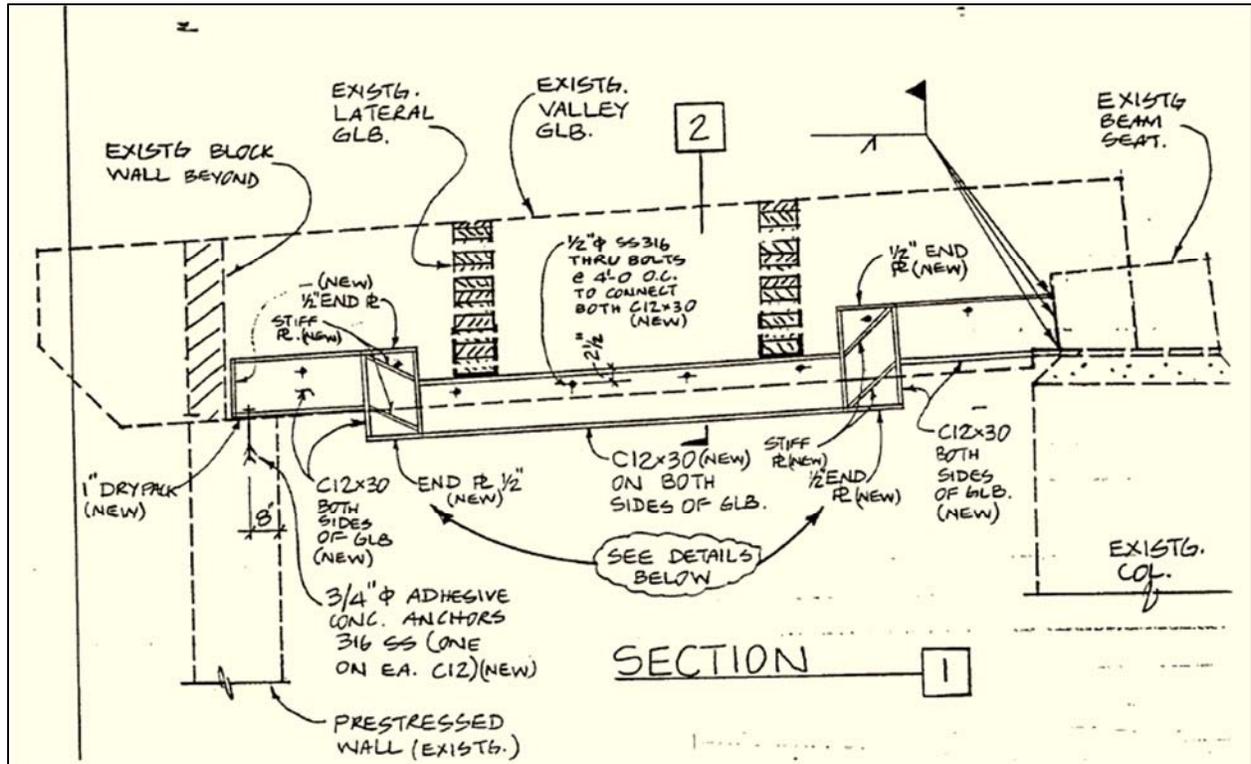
Figure A. Repair section sketch from 1994 repair plan by MW, for beams 13, 25 and 29.
